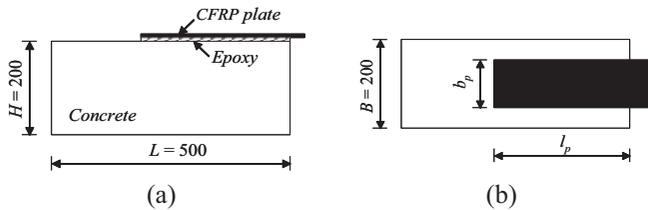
Details of pull-test specimen (unit: mm). (a) Side view. (b) Top view.
